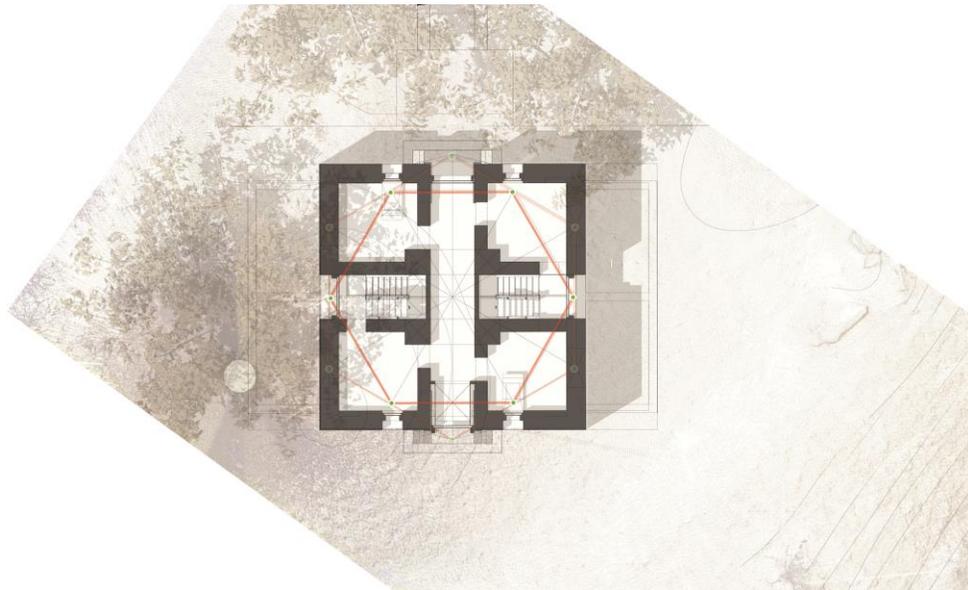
Blackwell Tower: Third Floor Plan Diagram
